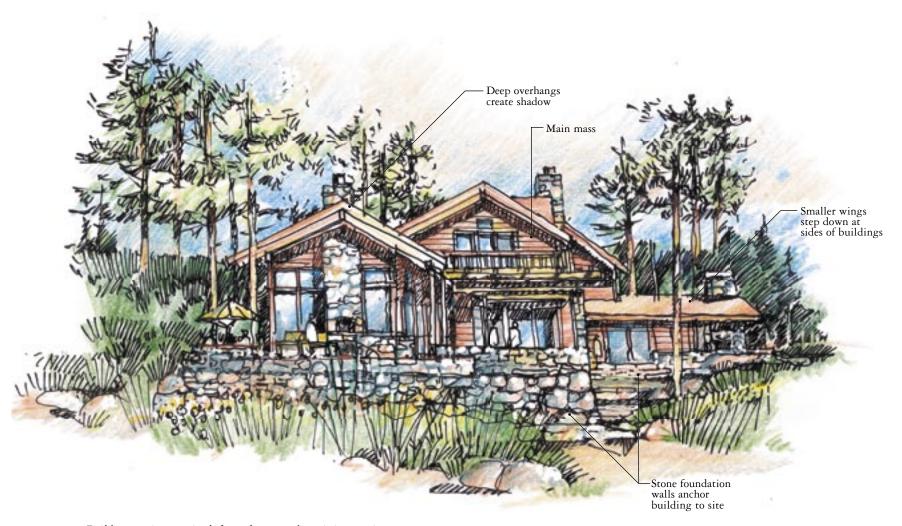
Building massing uses simple forms that respond to existing terrain
